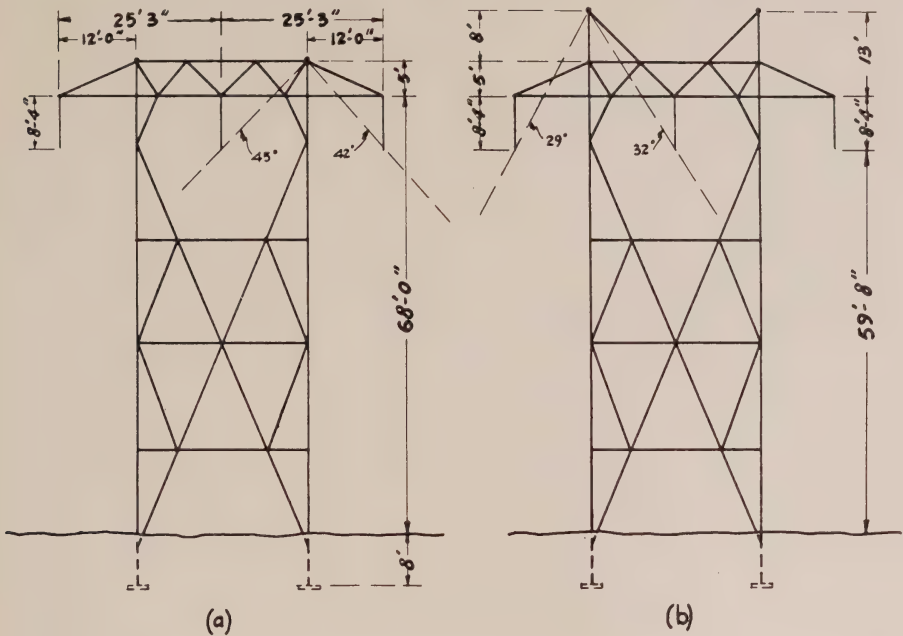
(a) Outline of original single-circuit 220 kv. tower showing major dimensions and shielding angles.
